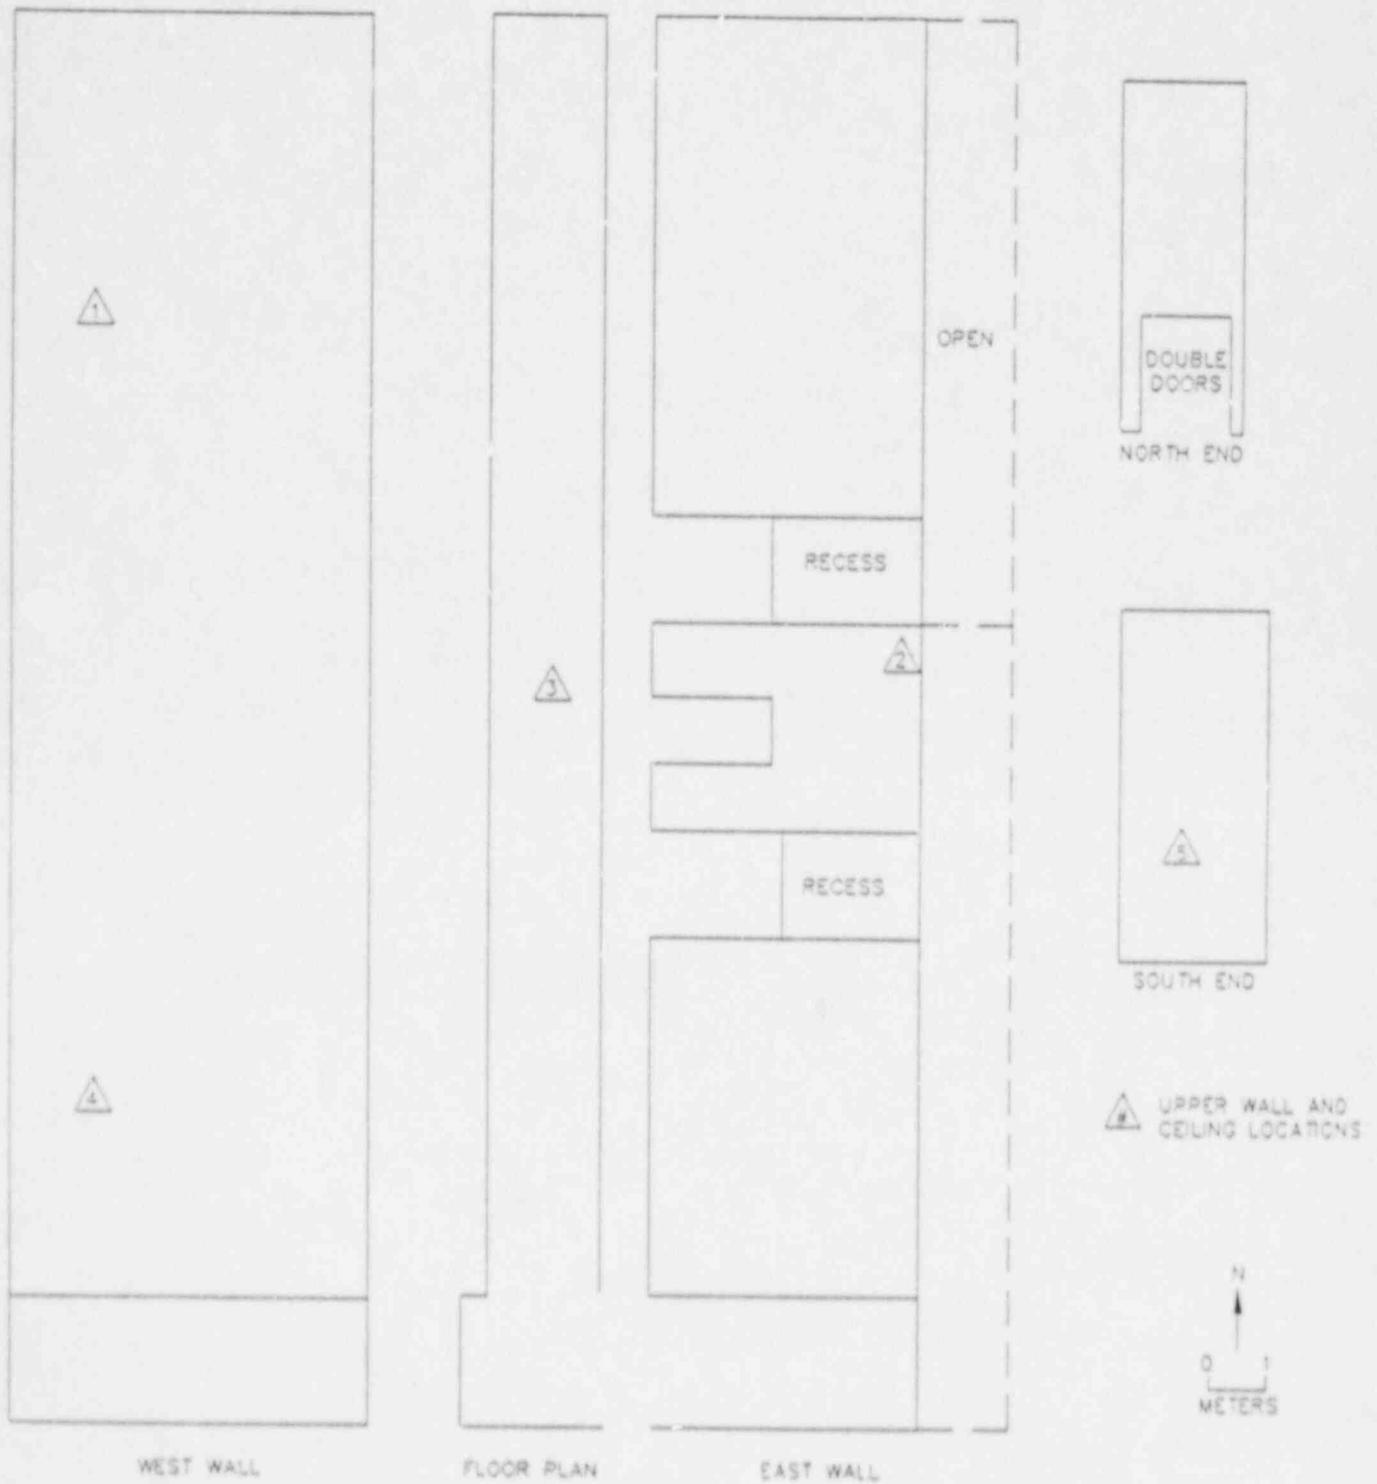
Hallway (Area 24) Showing Locations of Upper Wall and Ceiling Single-point Measurements
